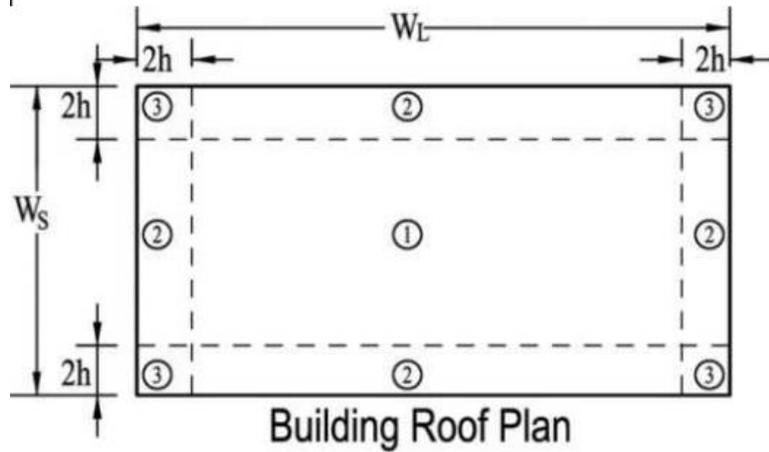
ASCE 7-16 Figure 29.4-7 shows the Building Roof Plan defining the roof zones.
